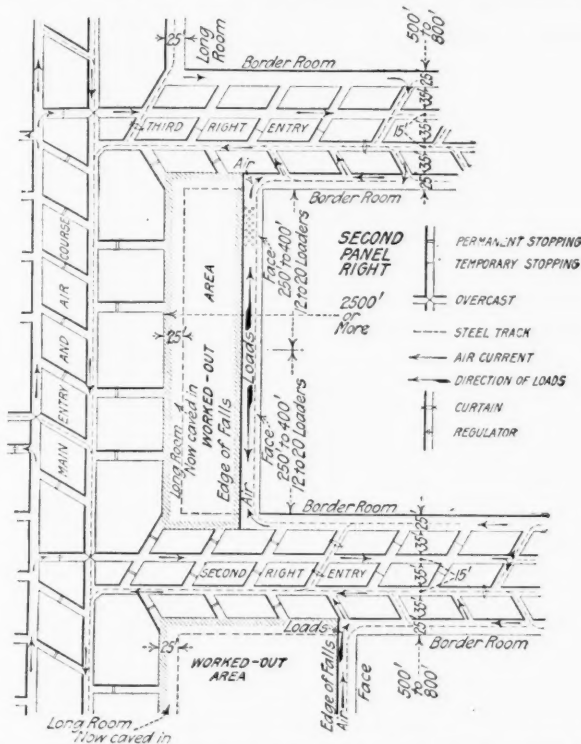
PLAN SHOWING VENTILATION AND HAULAGE
